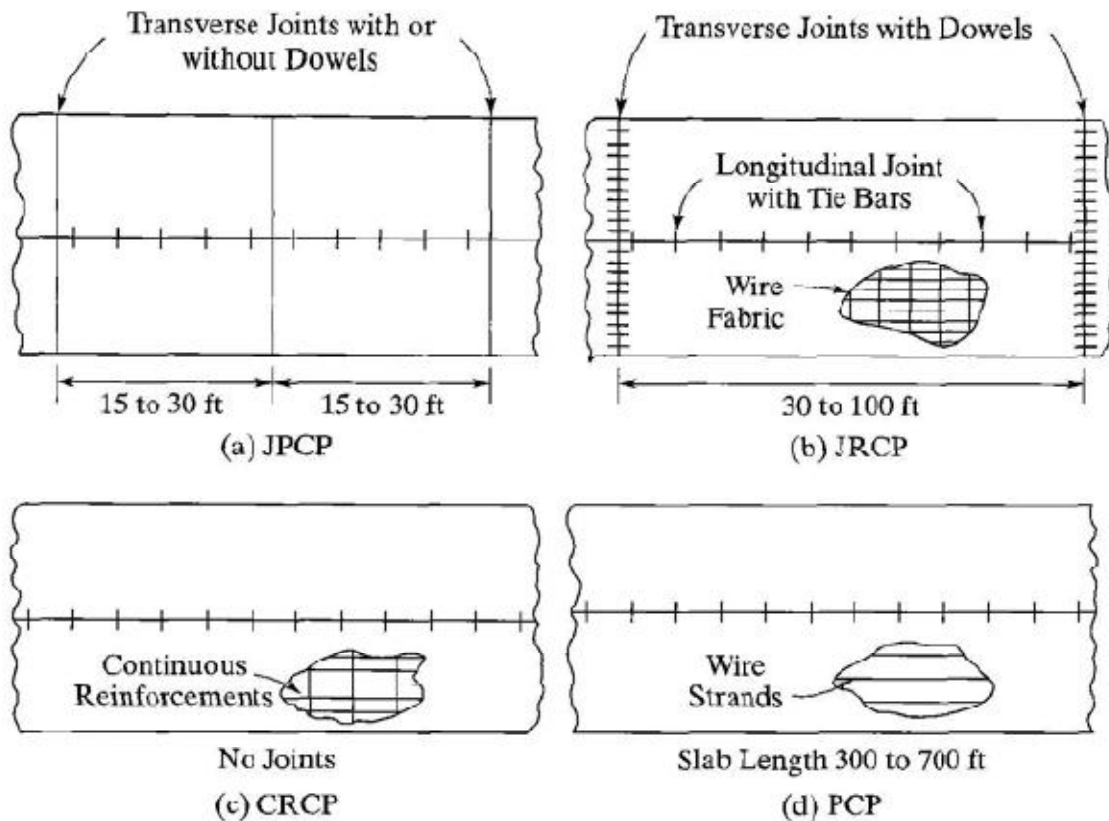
Four types of concrete pavements (1 ft = 0.305 m)
